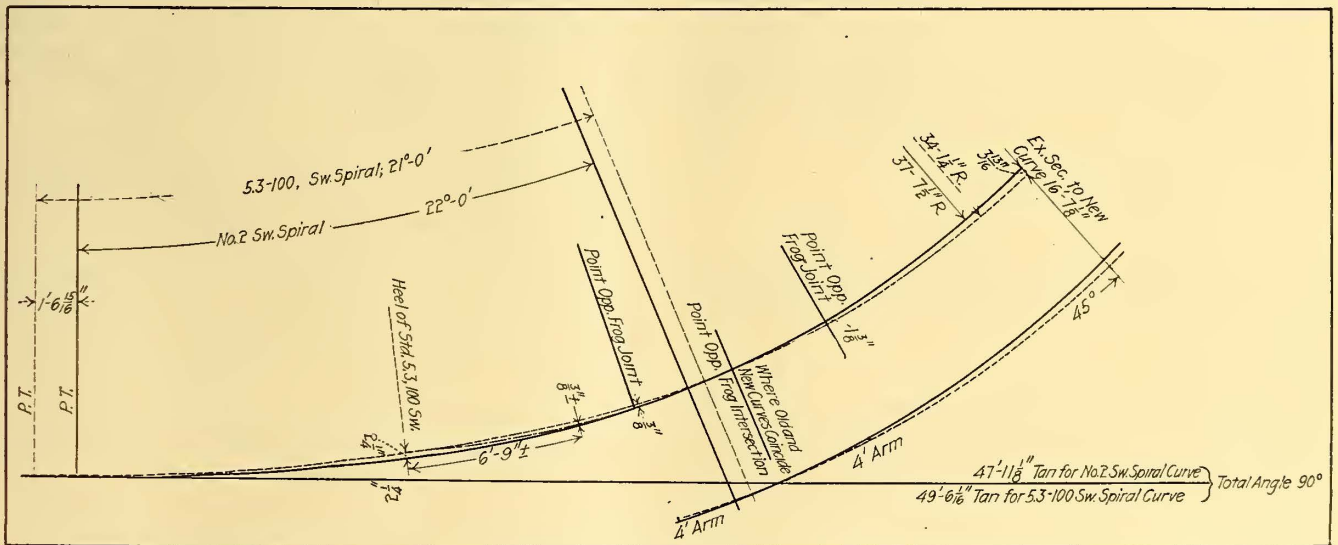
ILLUSTRATING PARTIAL RENEWALS OF OLD LAYOUT USING STANDARD SWITCH PIECES AND PROPOSED UNIFORM SPIRALS
